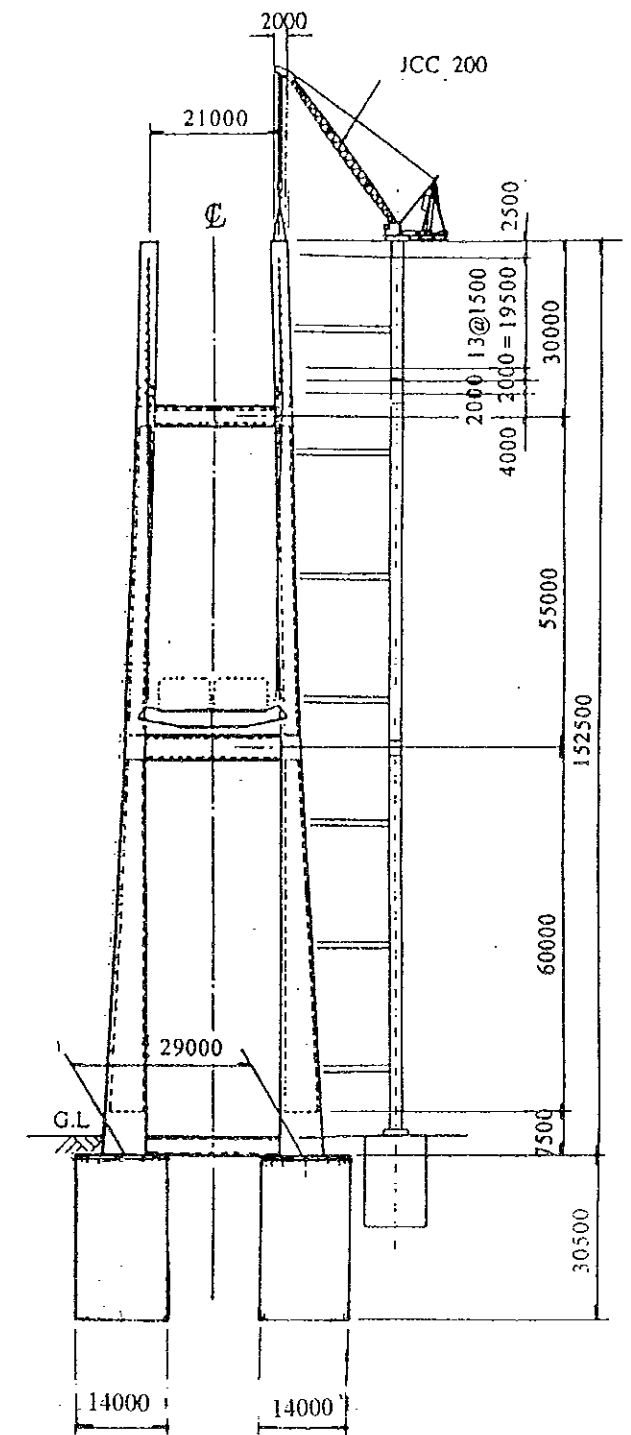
Conceptual Construction Sequence for Cable Stayed Bridge
